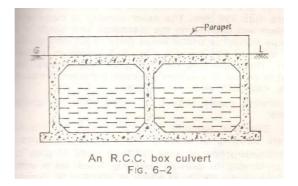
shows an R.C.C box culvert with two openings. Following points should be noted.
